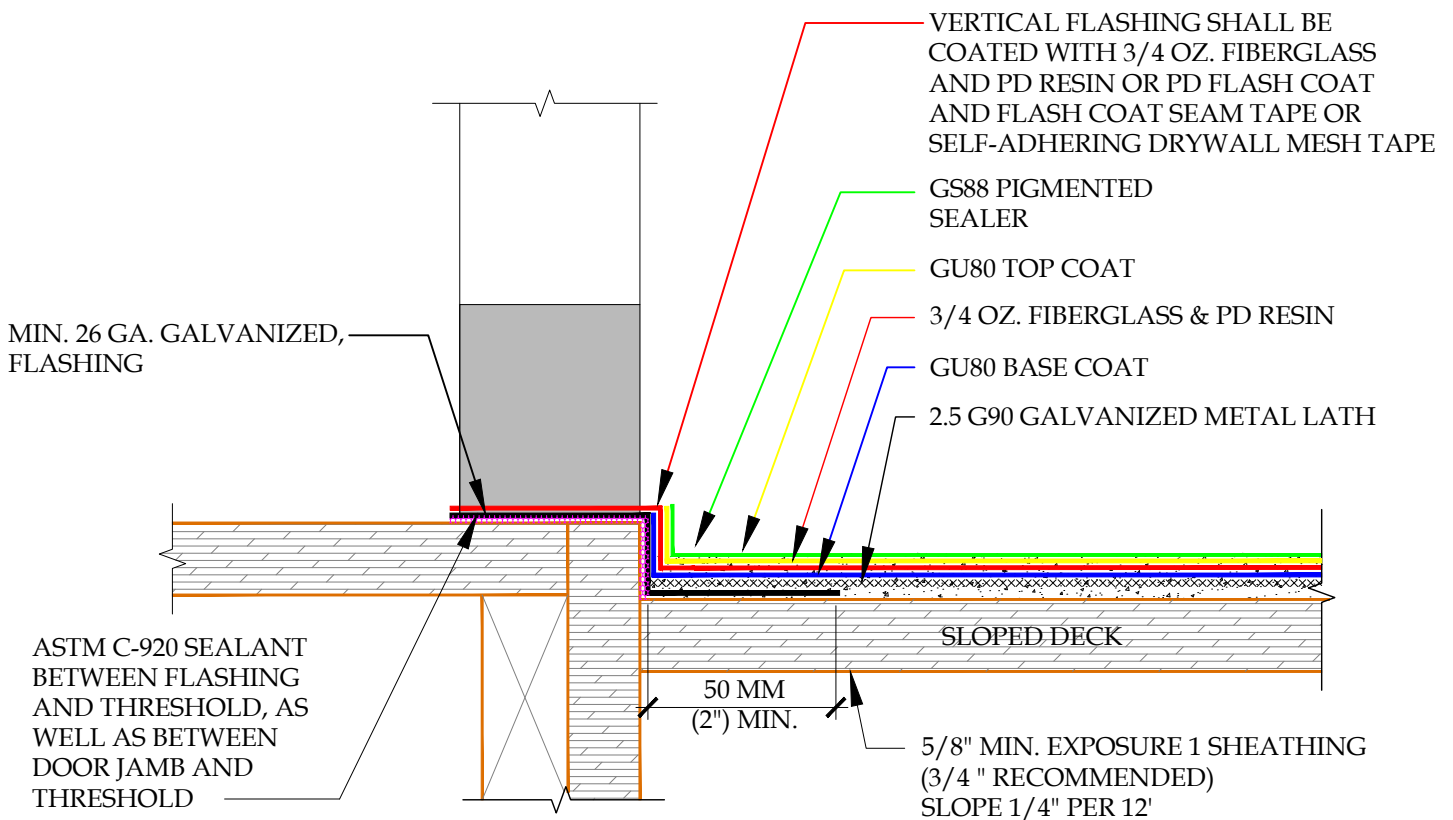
DETAIL-DOOR PAN FLASHING-ONE PIECE-INCLEMENT WEATHER
